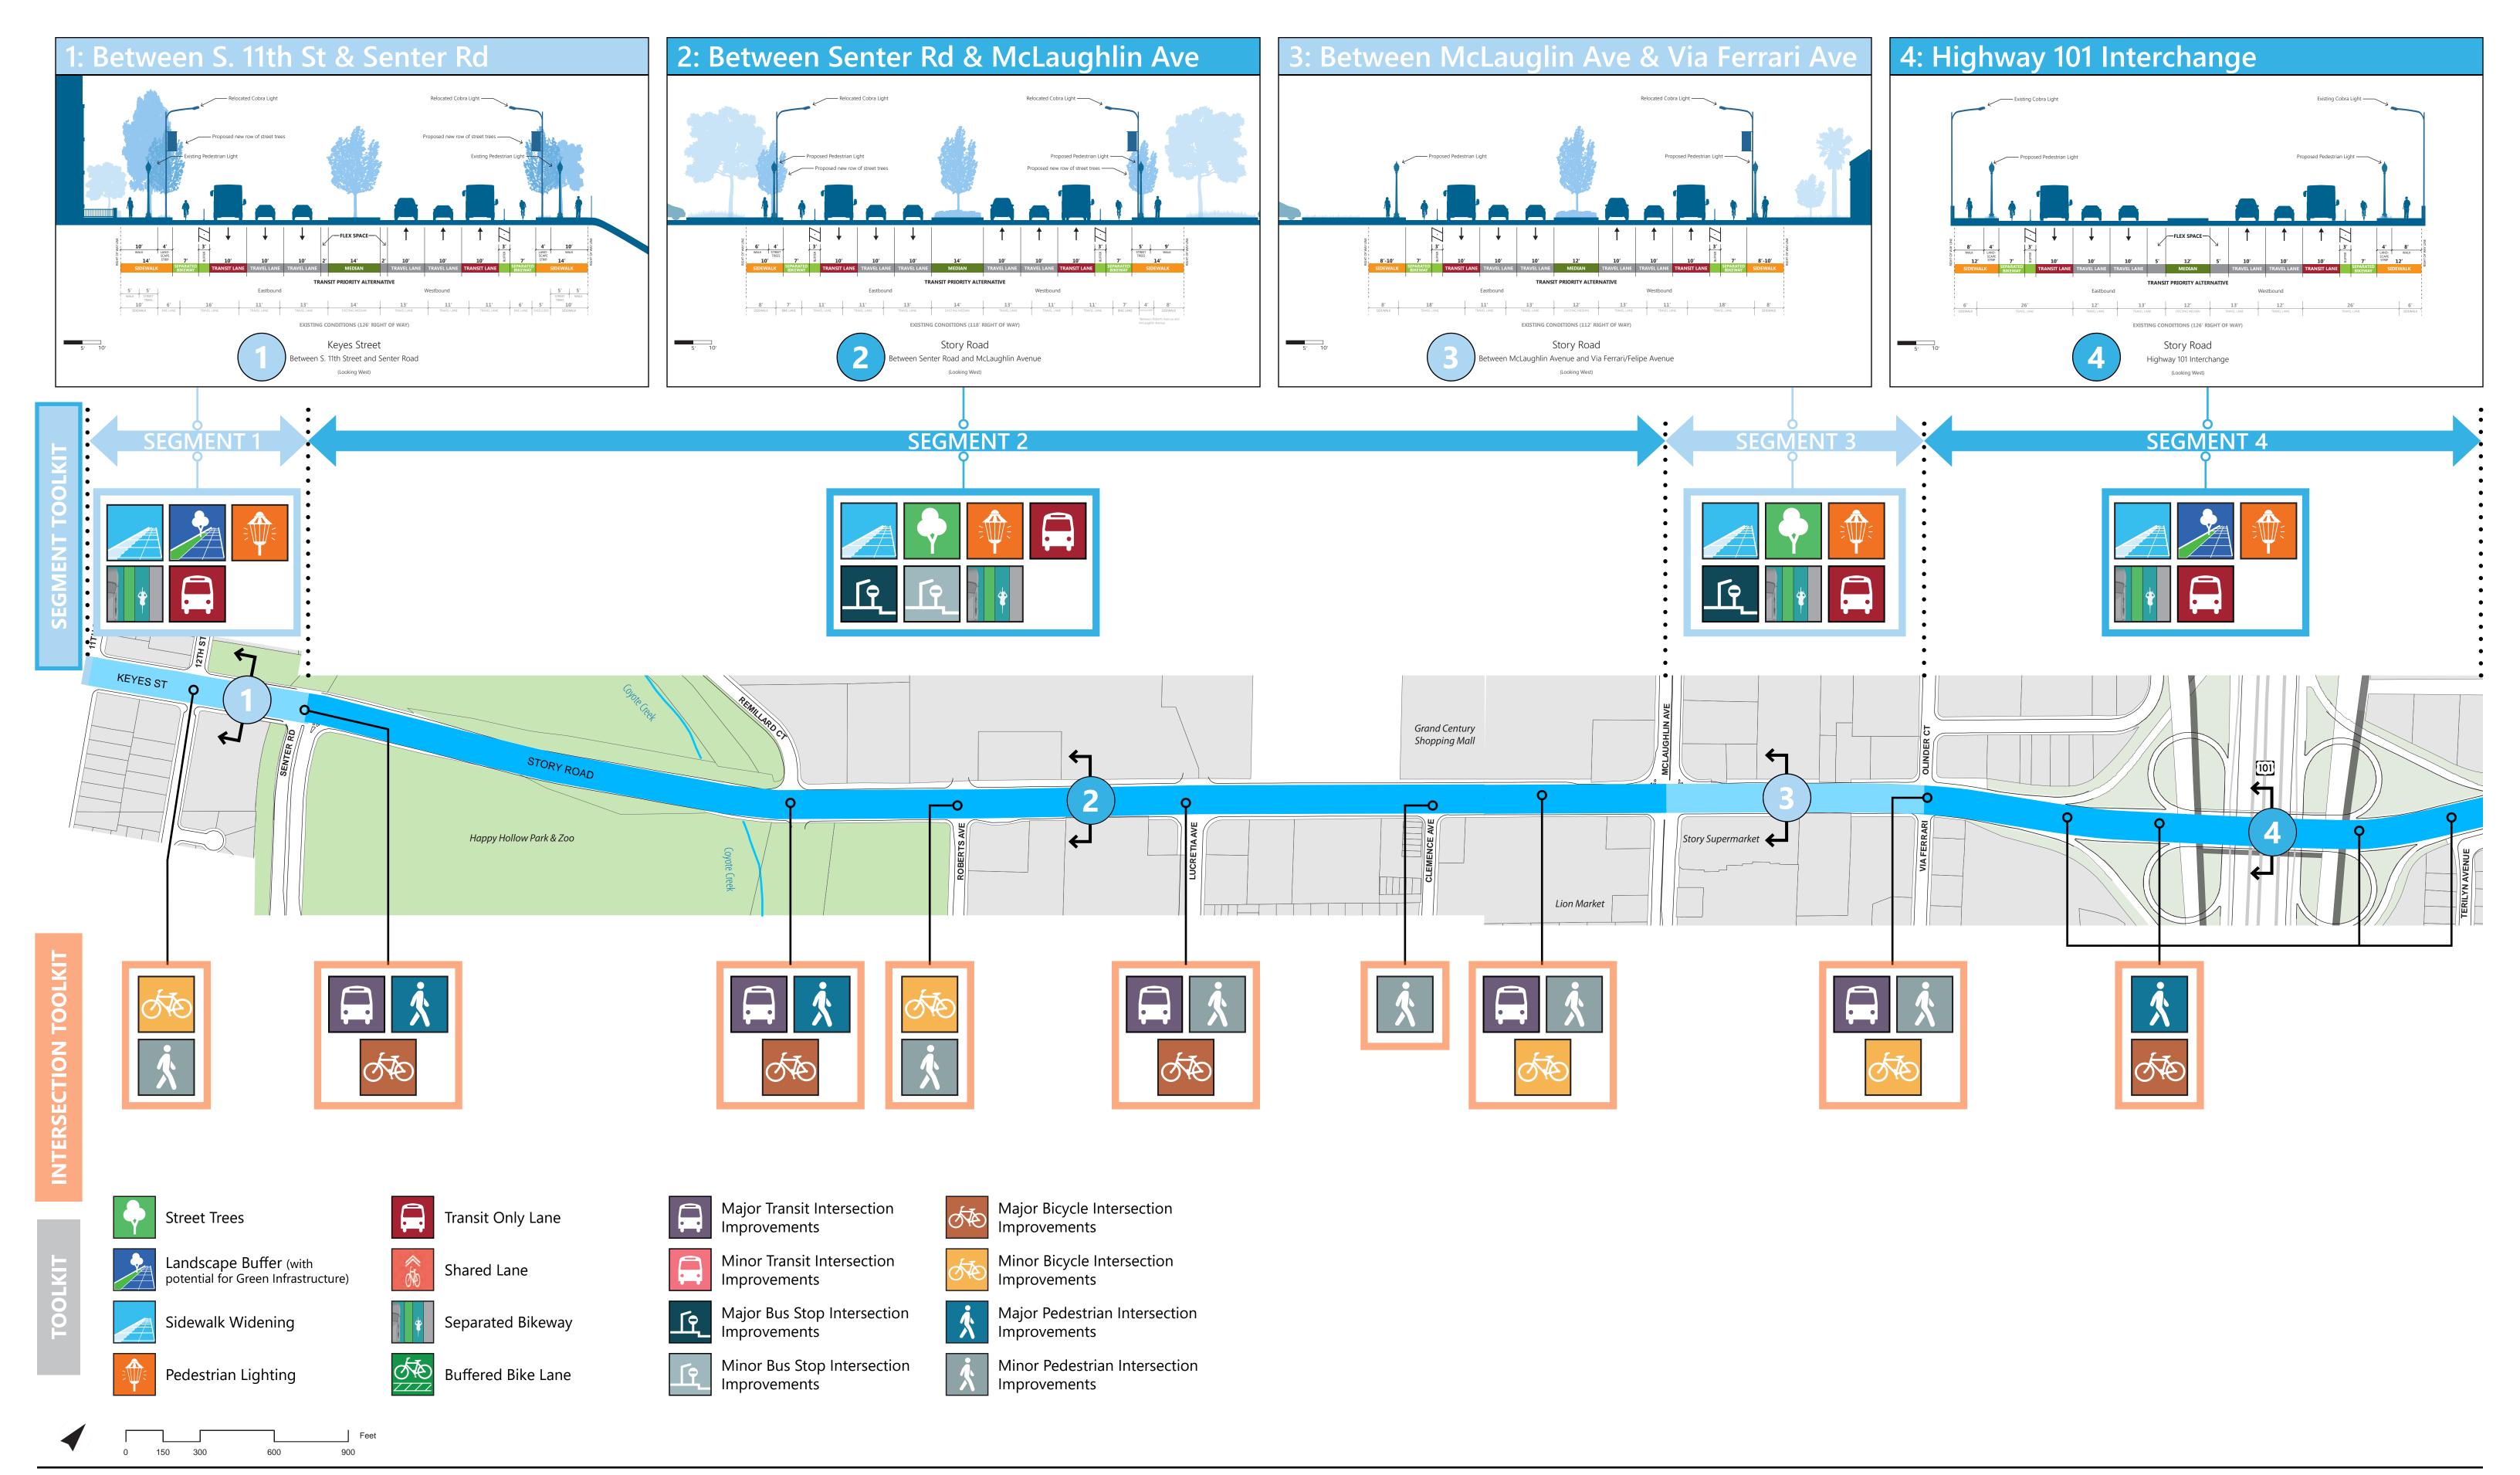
A: Keyes Street at S 11th Street to Story Road at Knox Avenue TRANSIT PRIORITY ALTERNATIVE
